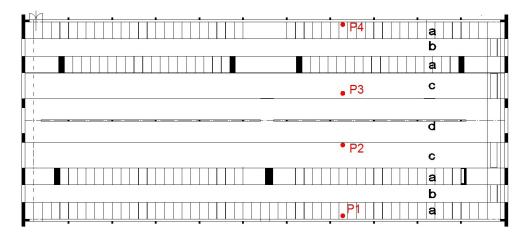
Ground plan of reconstructed dairy cows housing with air sampling locations
